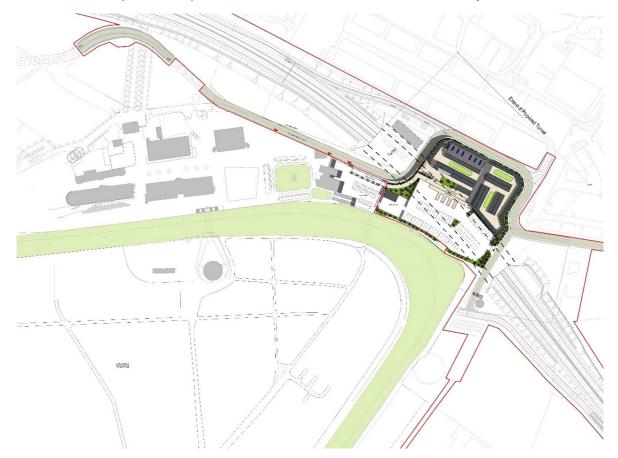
Proposed Permanent Stableyard Plan in overall Site Context
